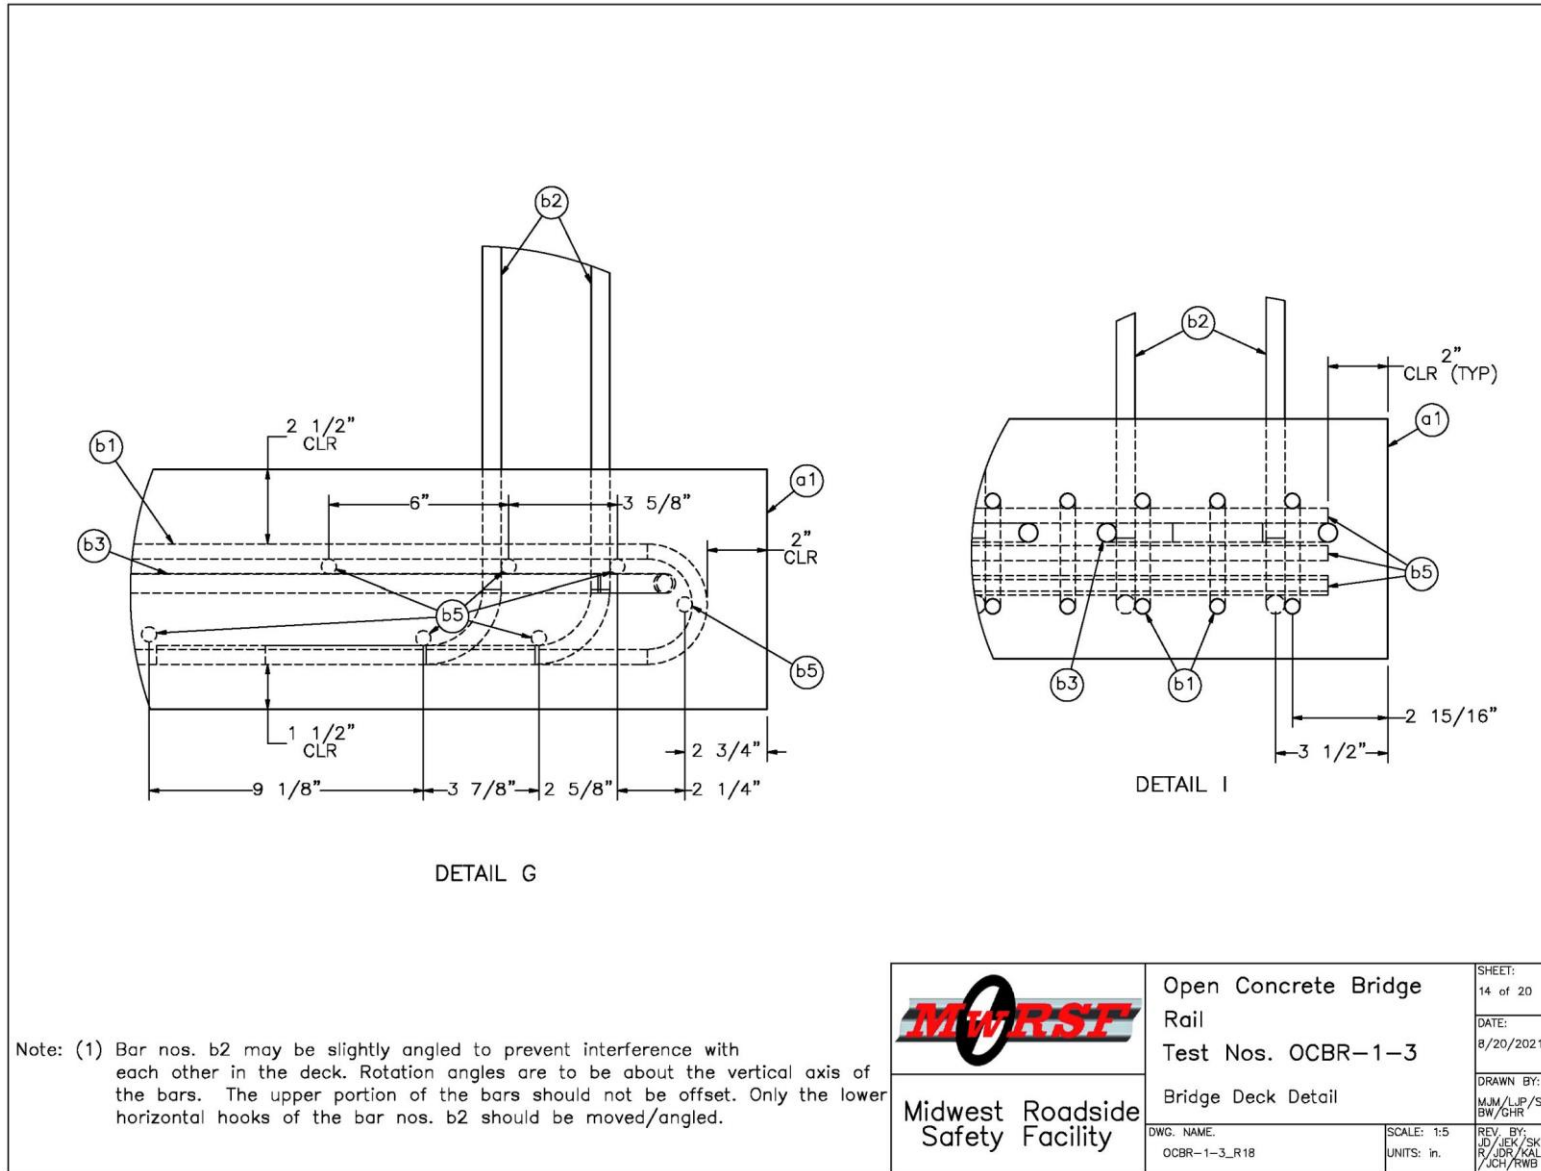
Bridge Deck Detail, Test Nos. OCBR-1, OCBR-2, and OCBR-3
